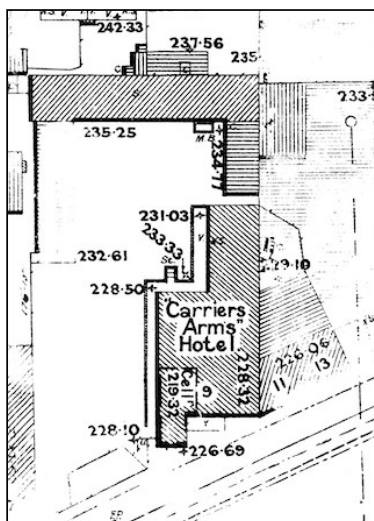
An extract from a sewerage plan showing the subject site in 1926. The hotel and rear stables are of brick (diagonal hatching) while a since-demolished woodshed abutting the stables was of timber (straight hatching). (Source: Ballarat Sewerage Authority, Detail Plan No. 4, 1926).
